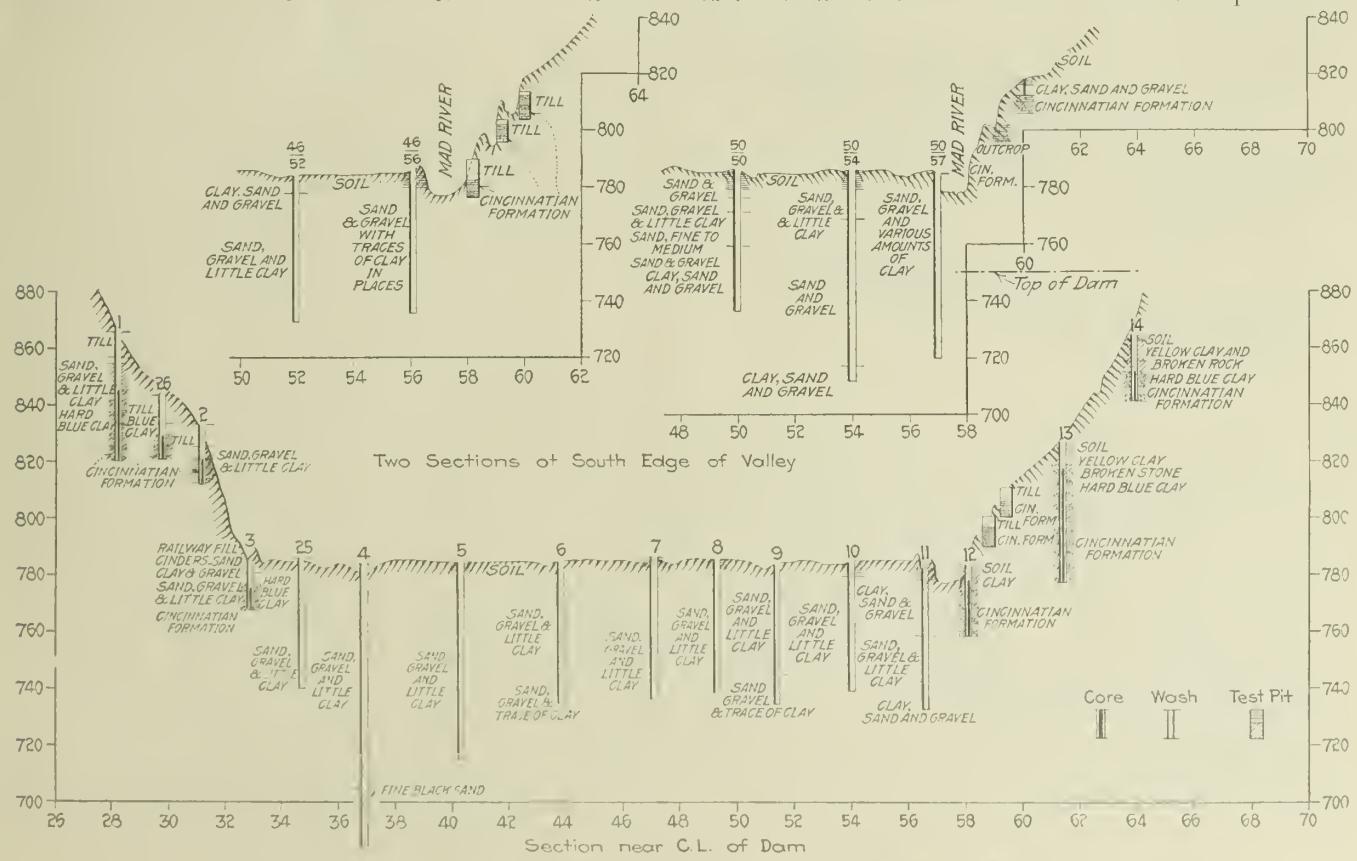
SECTION OF MAD RIVER VALLEY AT HUFFMAN DAM SITE
